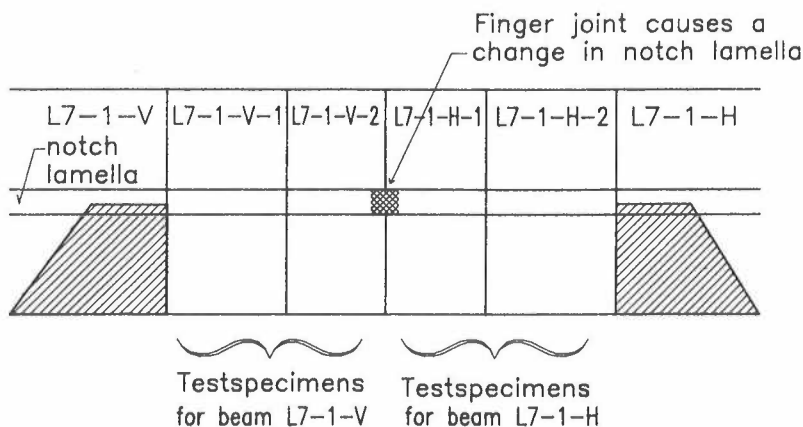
Test specimens in the case where the notch lamella changes between two neighbour beams. A pair of test specimens is required for each beam.
